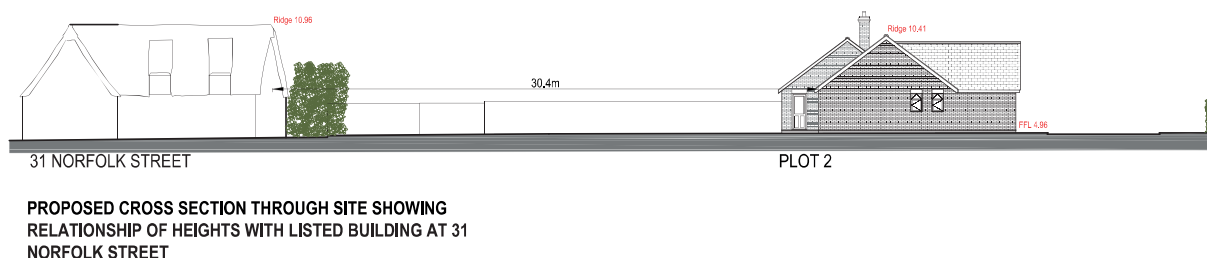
Cross Section of the proposed dwelling and 31 Norfolk Street showing ridge heights and separation distance.
